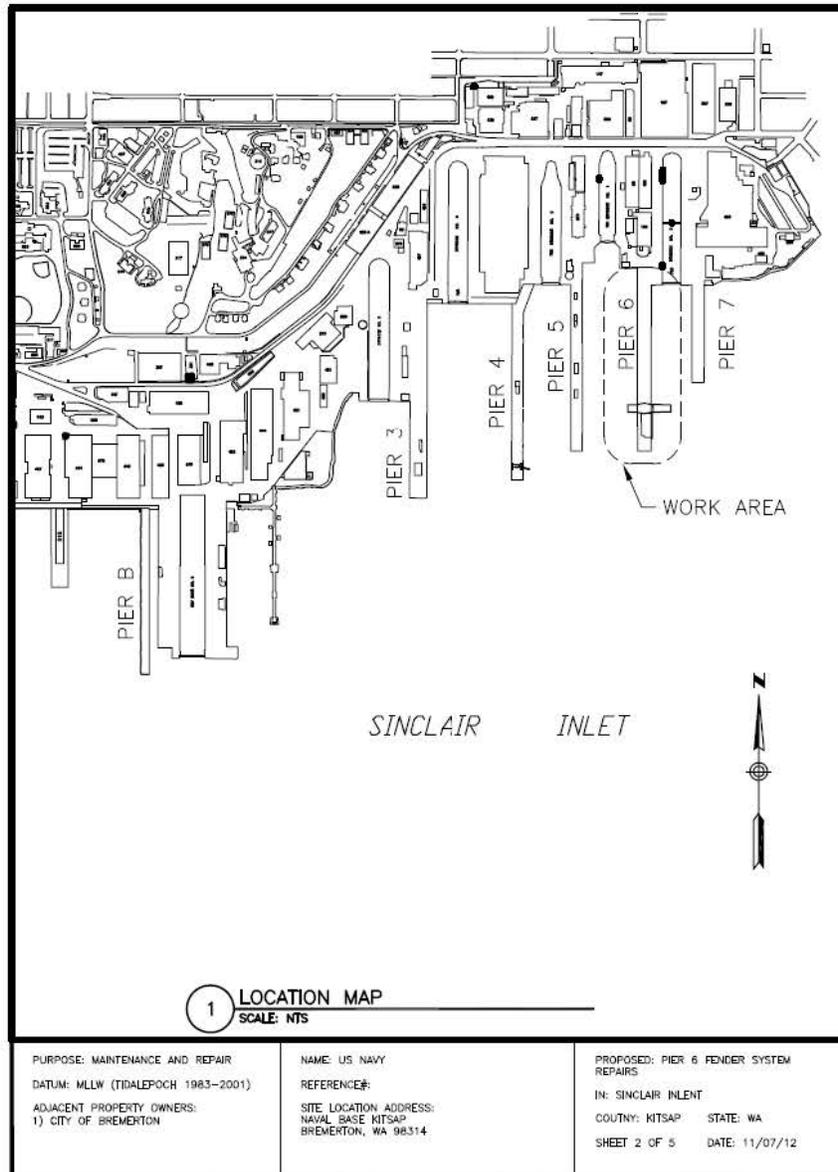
Pier 6 at NAVBASE Kitsap Bremerton
